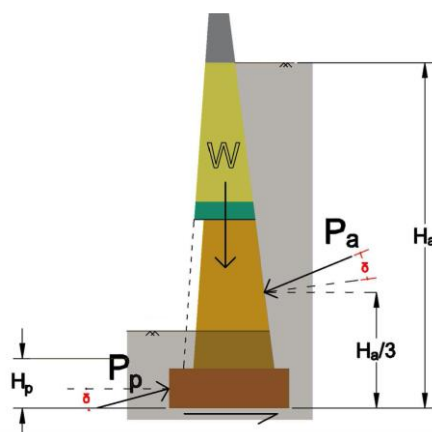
The forces acting on a unit section of the wall from the part consisting of Arches 1 – 5.
